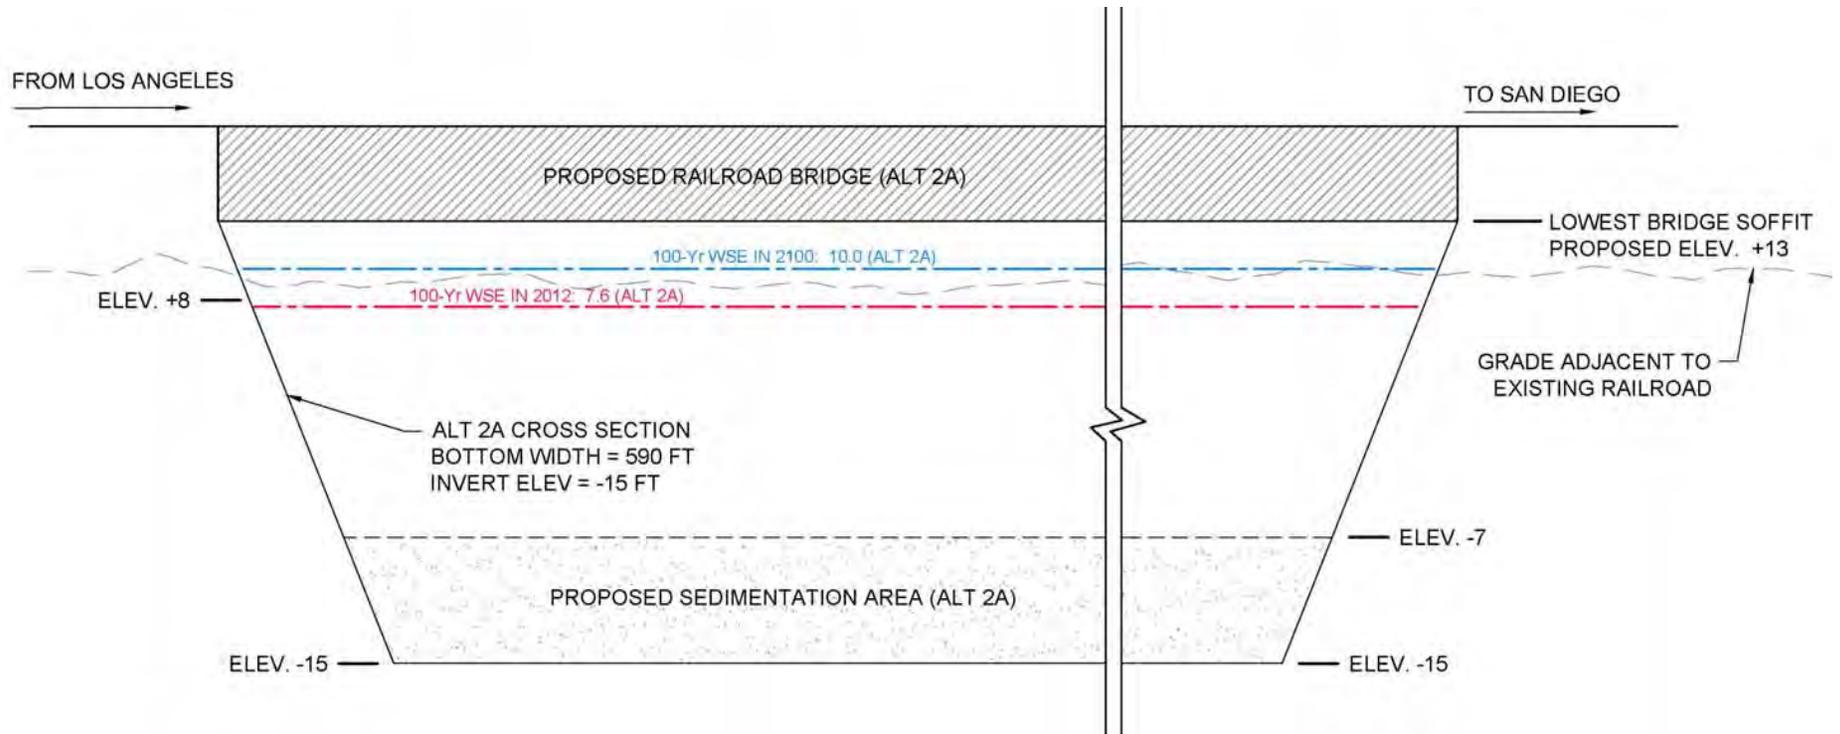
Proposed Alt 2A Railroad Bridge Channel Cross-Section
